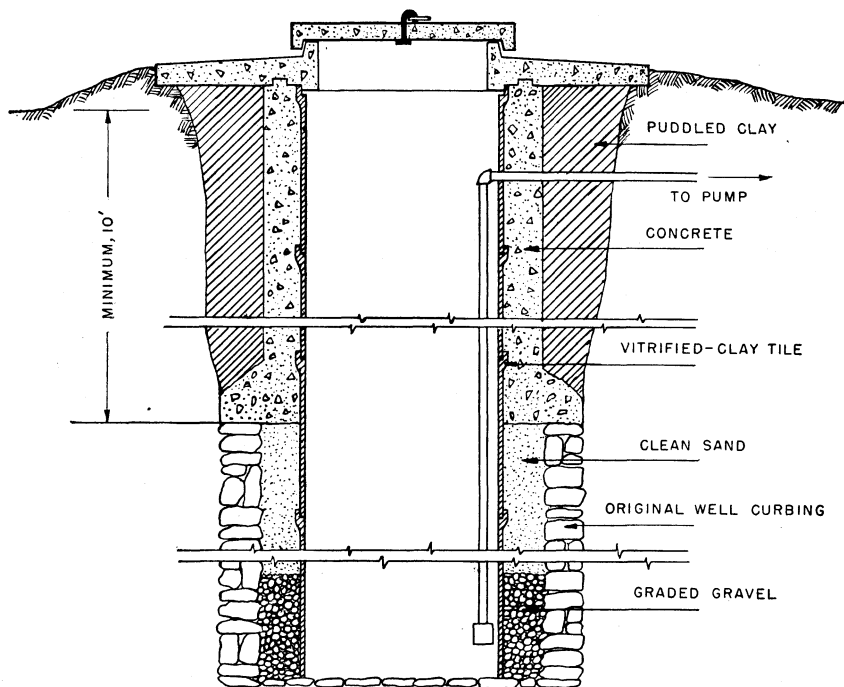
Existing well, reconstructed with vitrified clay tile for curbing and fills of concrete, sand, and gravel.
